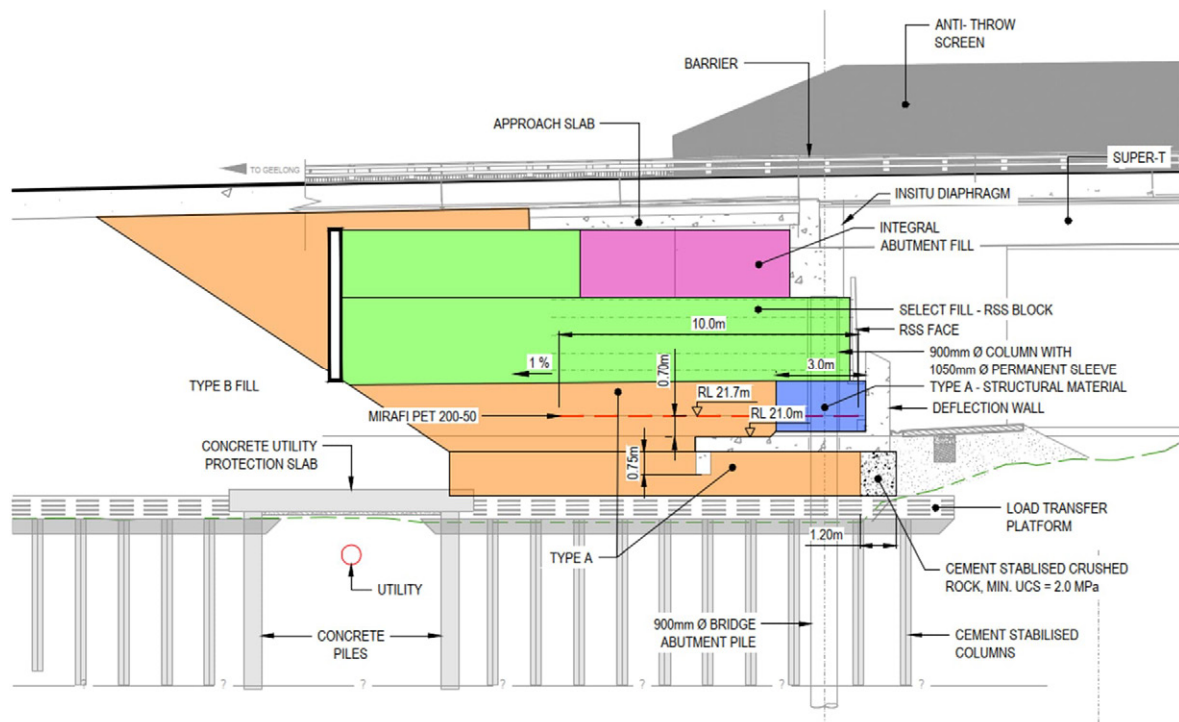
Hybrid retaining wall (L-shape wall + RSS wall) with ground improvement at south abutment
